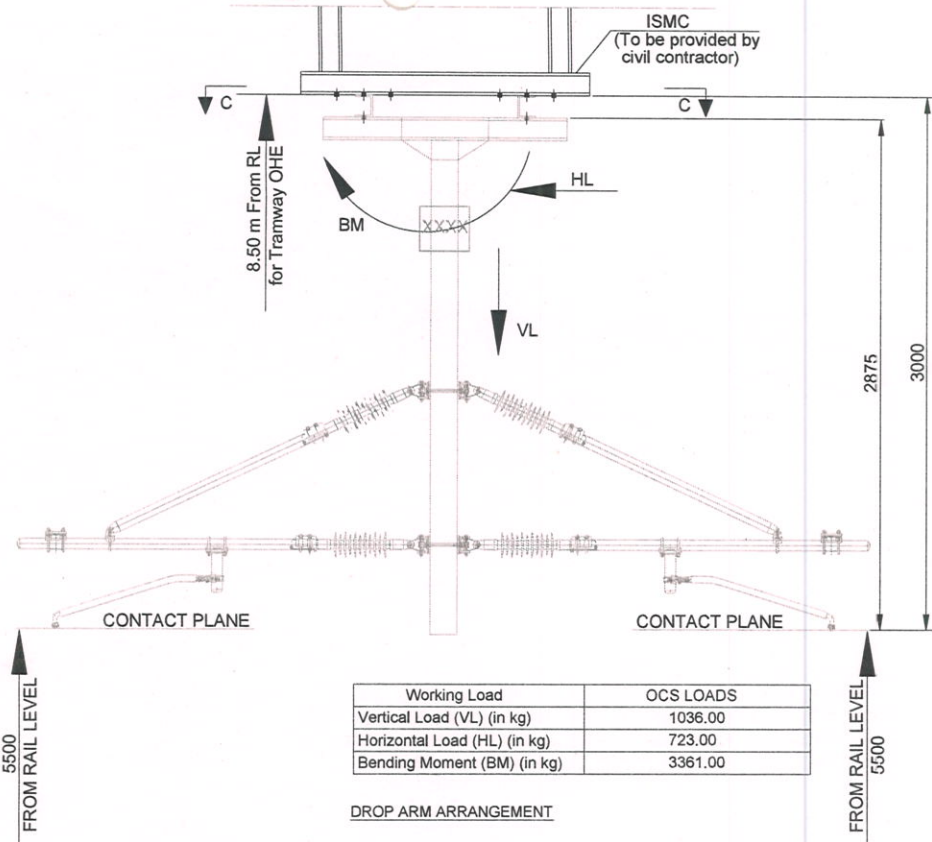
DETAIL-C TO BE PROVIDED FOR LOCATION NUMBERS OPC-1 TO OPC-17 AS SHOWN IN PLAN VIEW DRAWING NUMBER- OCS-SYI-T00-0009-001
